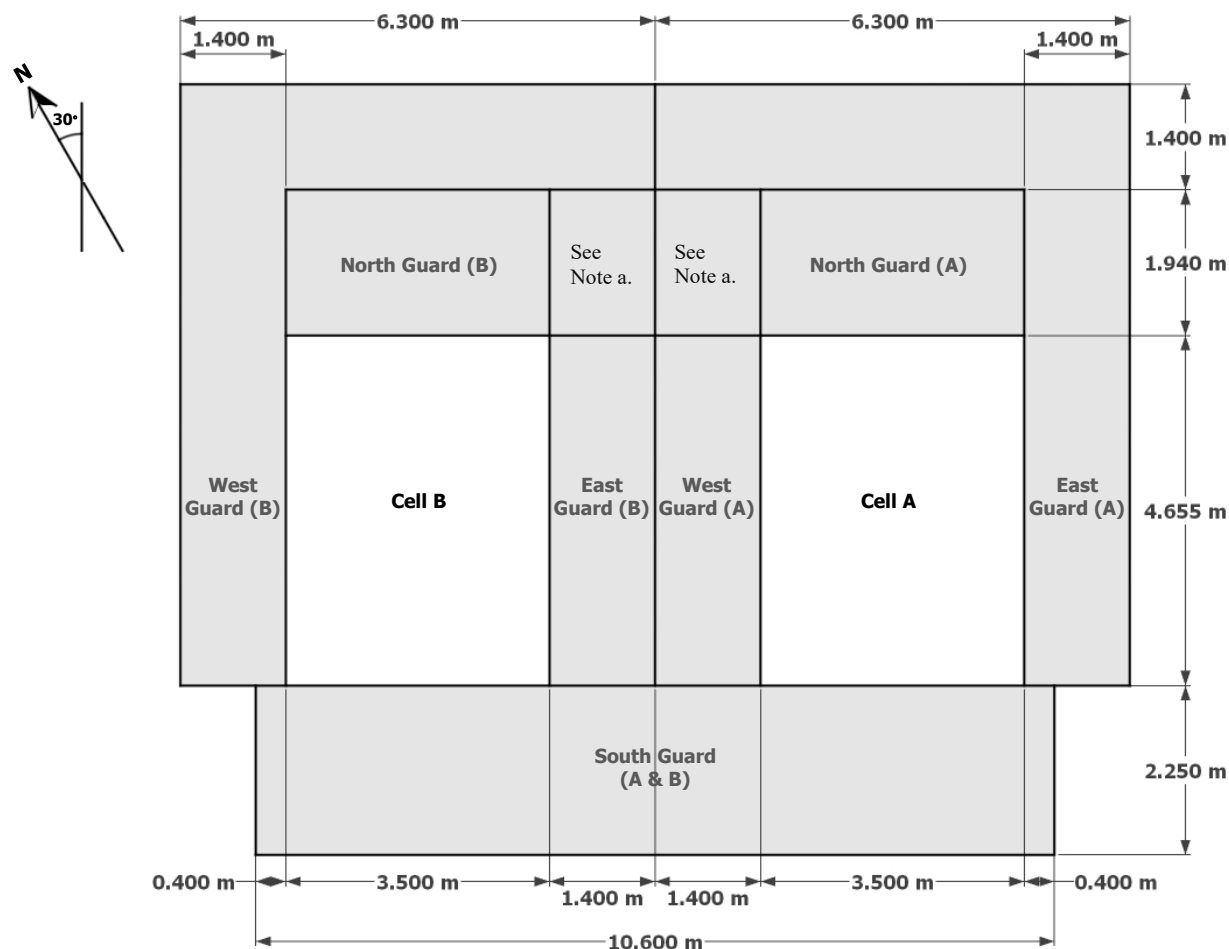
Alternative summary geometry with guard zone dimensions: plan
